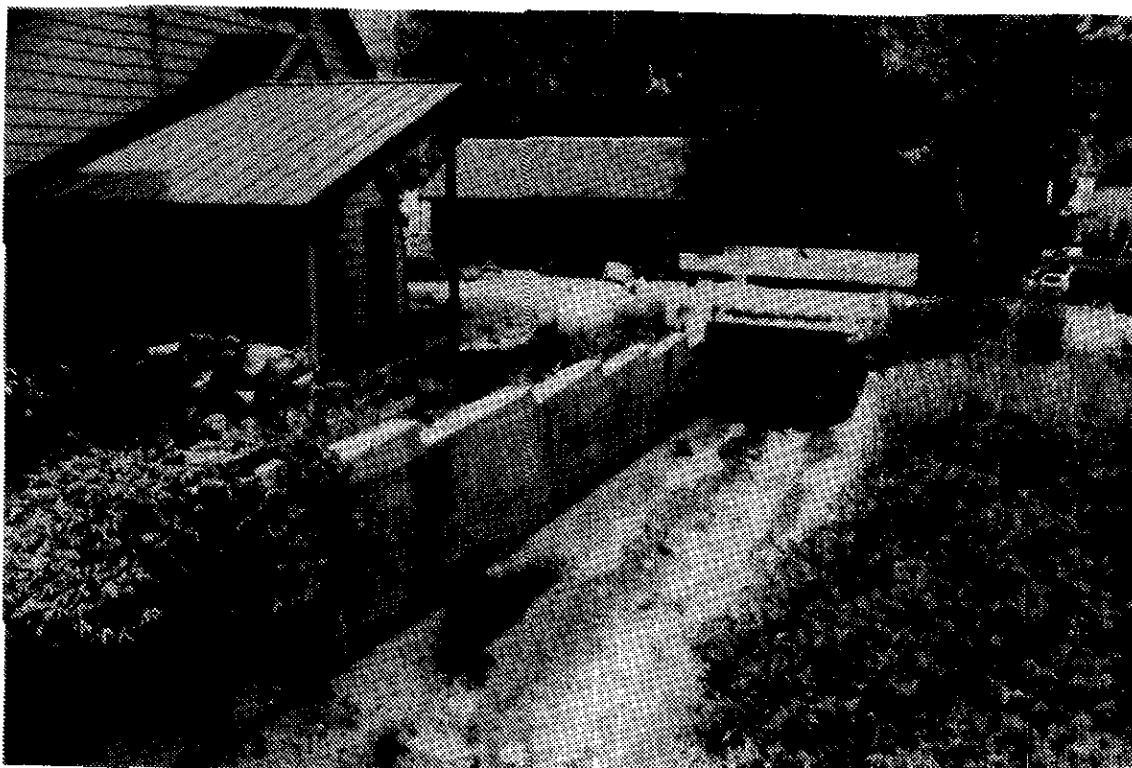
The floodway is contained by floodwalls and a concrete streambed. Ouray, CO.
